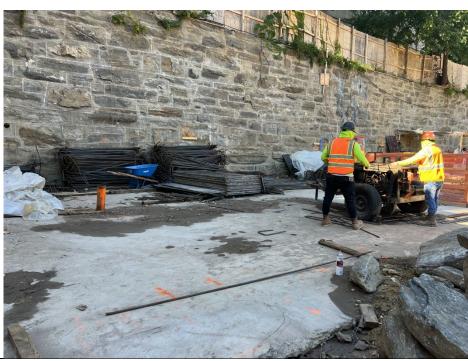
Rebar and vapor barrier installation at footings, view facing north
